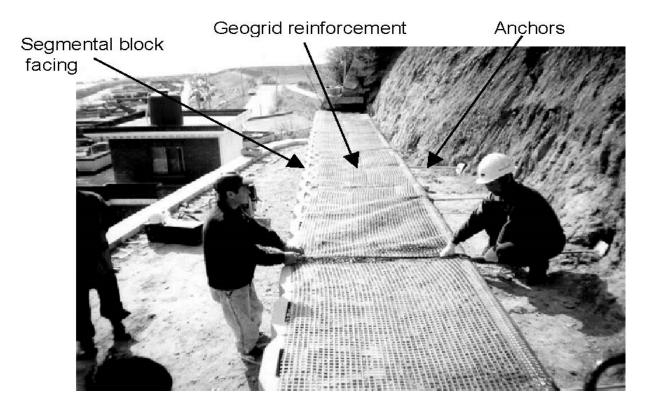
Geogrid reinforced segmental block wall with a constrained reinforced fill zone
